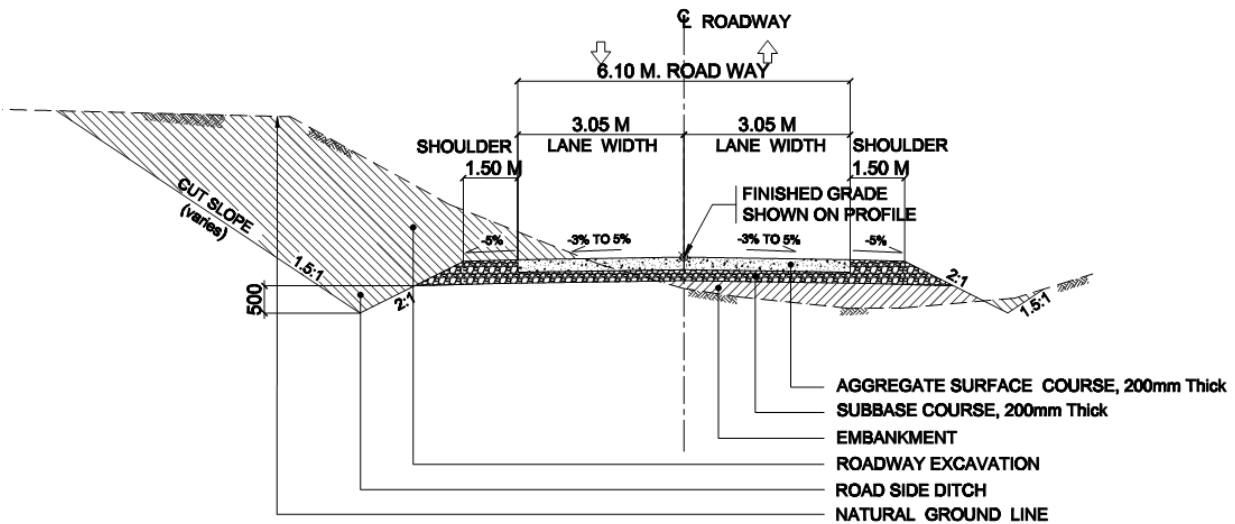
TYPICAL ROADWAY CROSS-SECTION FOR ROAD OPENING
